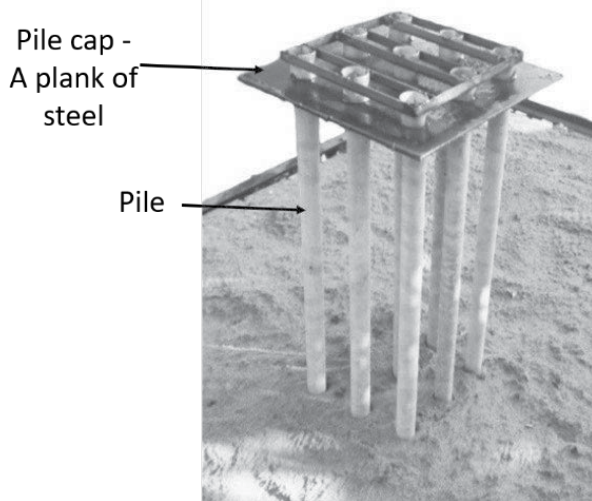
Details of the connection structure of the pile group - pile cap. Pile group arrangement  $3 \times 3$  piles, pile spacing  $S = 3D$  and  $6D$
